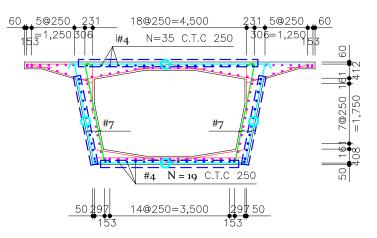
Reinforcement in longitudinal direction Unit: mm
